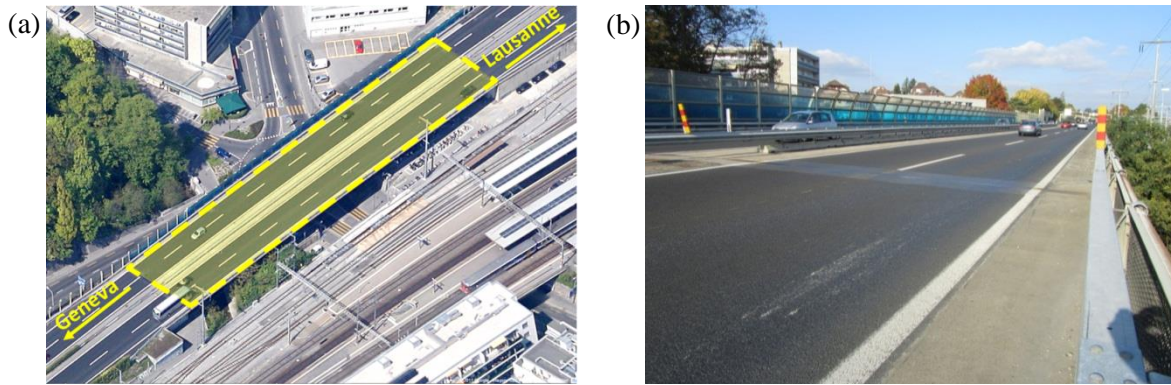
(a) Aerial view of bridge adjacent to Morges train station ([www.googlemaps.com](http://www.googlemaps.com)) and; (b) View towards Lausanne showing thermal expansion joint (Geneva end).
